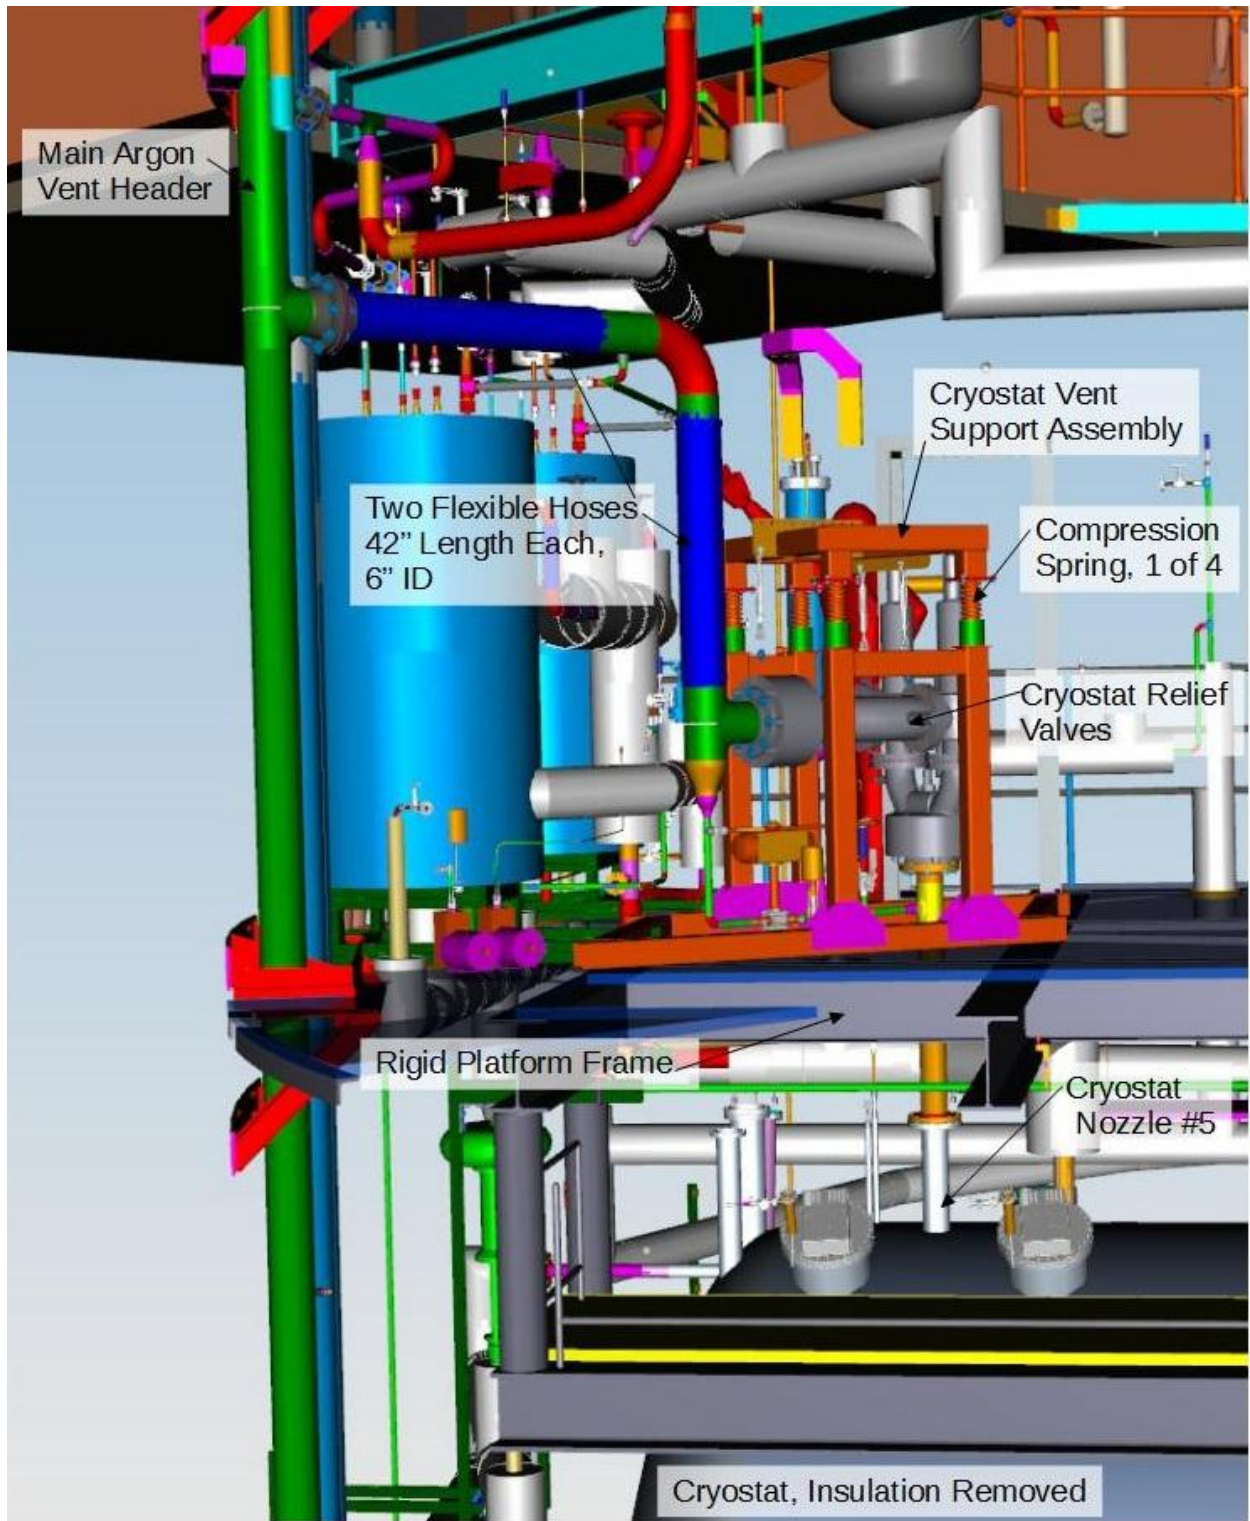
View of the supports of the Cryostat relief valves and diverter valves.
